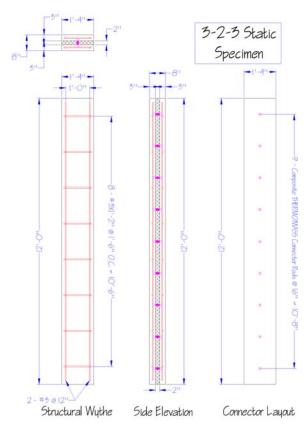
Conventionally Reinforced 3-2-3 Static Sandwich Panel Specimen
